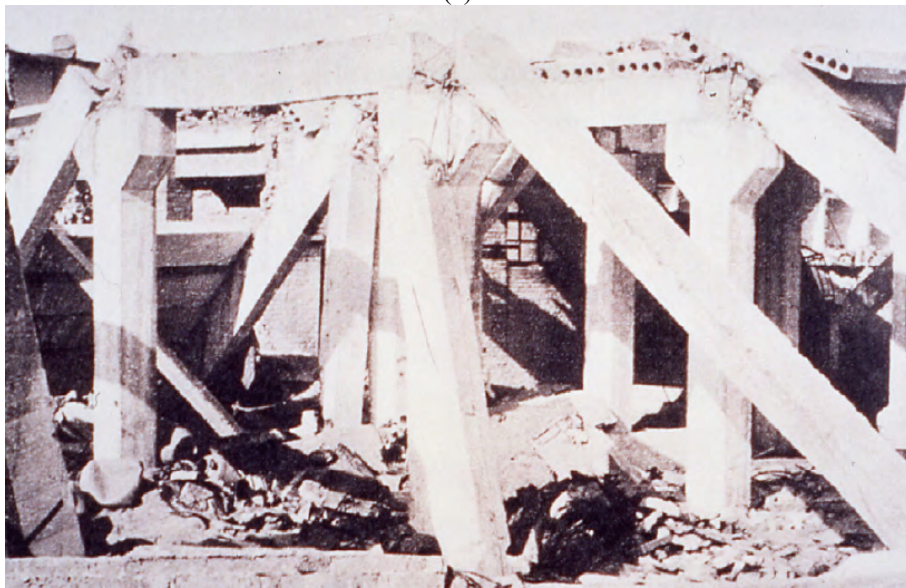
“Collapse of precast concrete hollow core floor (1994 Northridge Earthquake)” (FIB 27, 2003).
